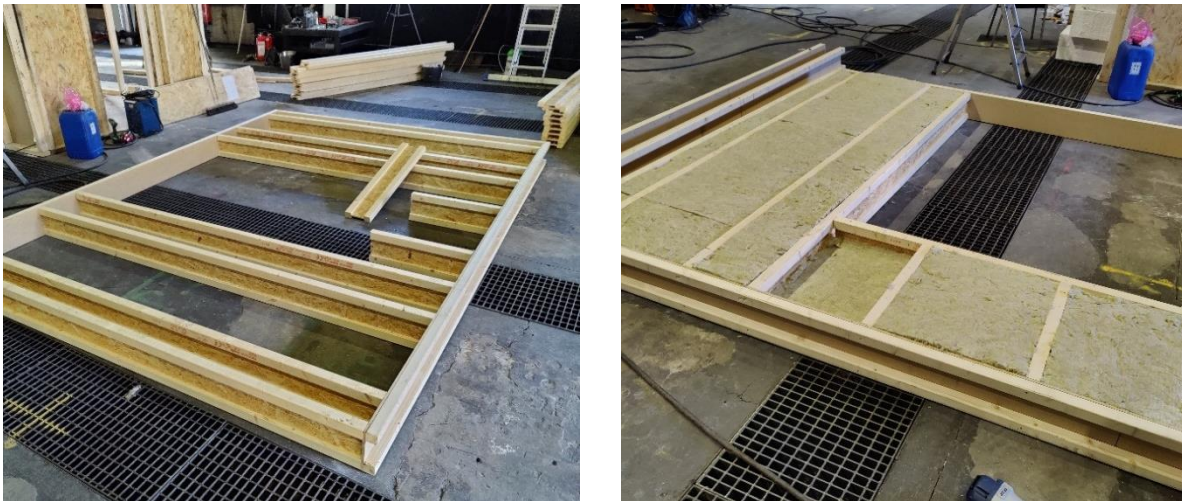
LEFT: Wall framing; RIGHT: Insulating the cavities
